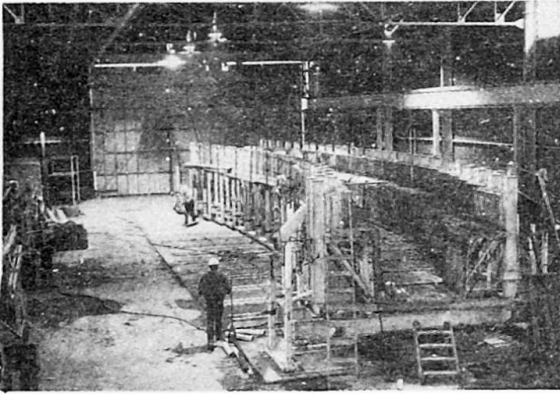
Adjustable Form for Box Girder Beam Fabrication
